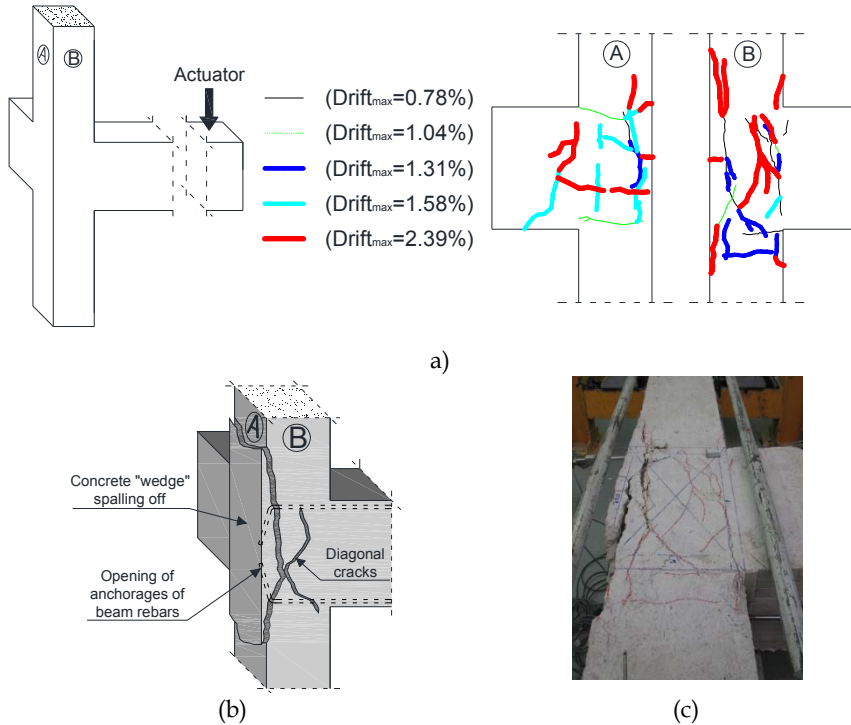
Specimen T_C1: crack pattern (a); failure mode (b); final damage report (c).
